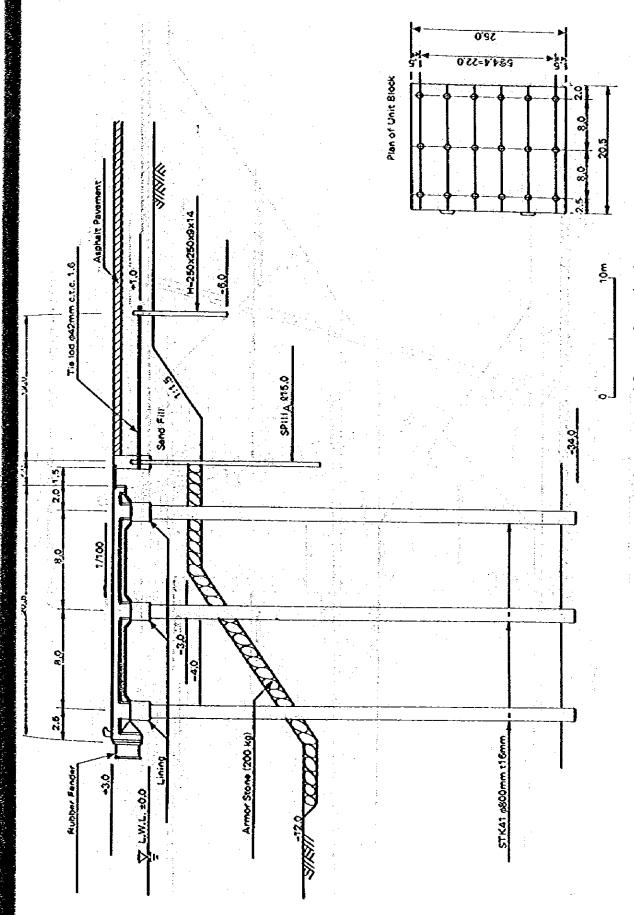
(11) Standard Crosssection of General Cargo Berth (Open Type with Vertical Piles)
